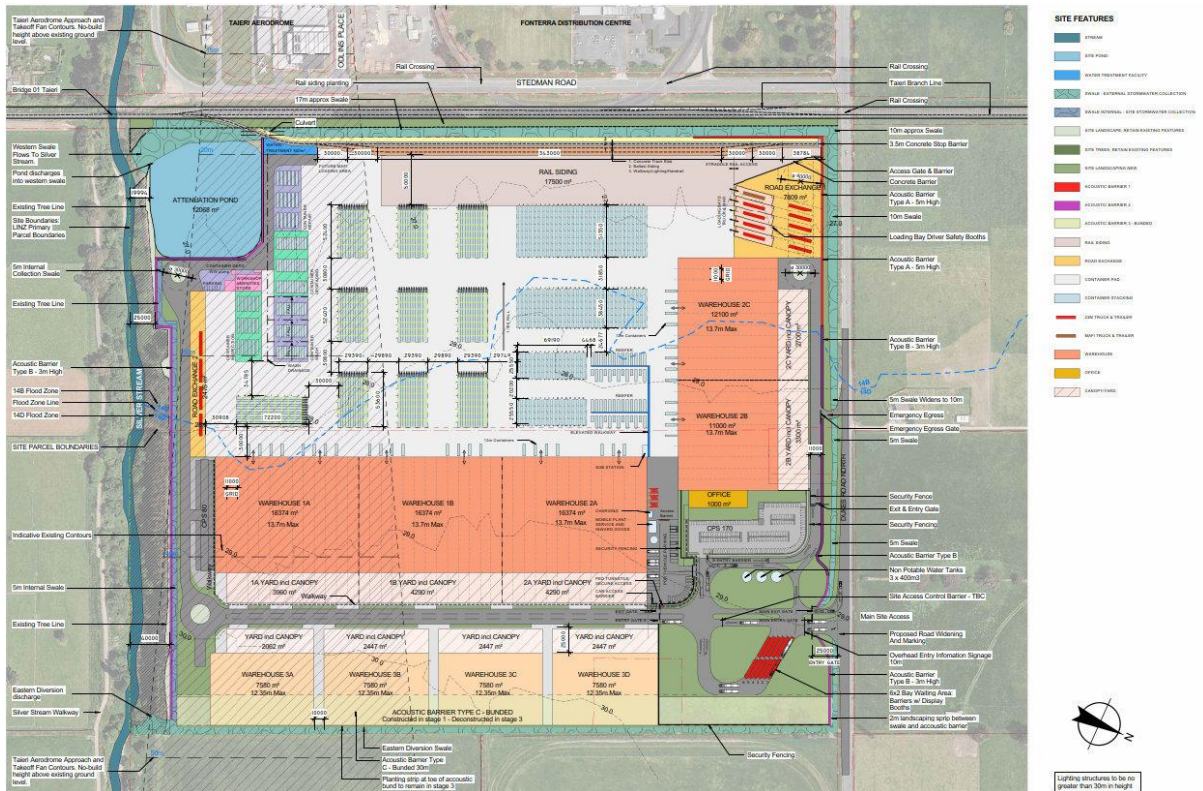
Concept plan of the proposed development (Williams Architects Limited, Master Plan Concept 9.2, dated 20 February 2026).
